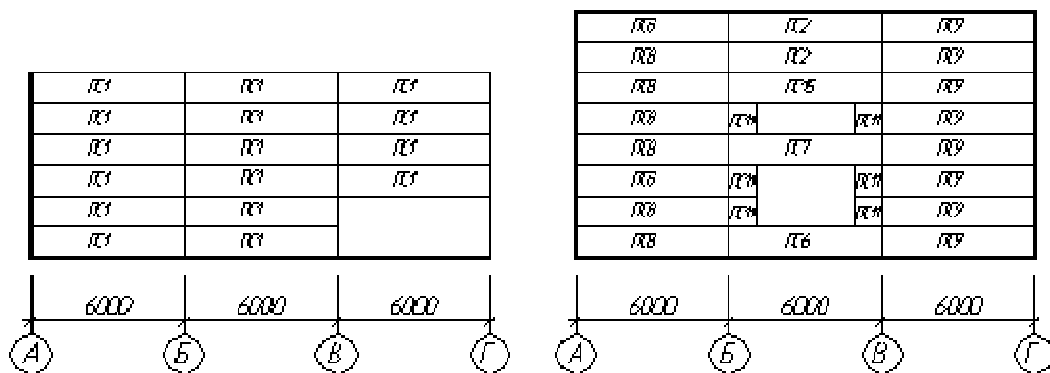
The layout of the wall panels along the axis 10 and 11.
